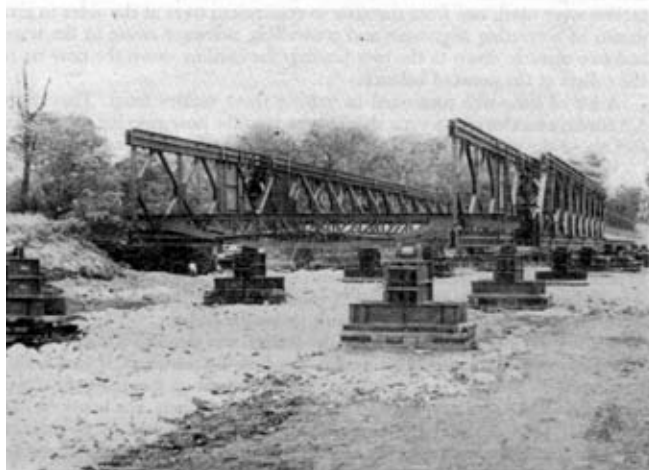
Home bank roller layout with the nose and DSR for span complete.
